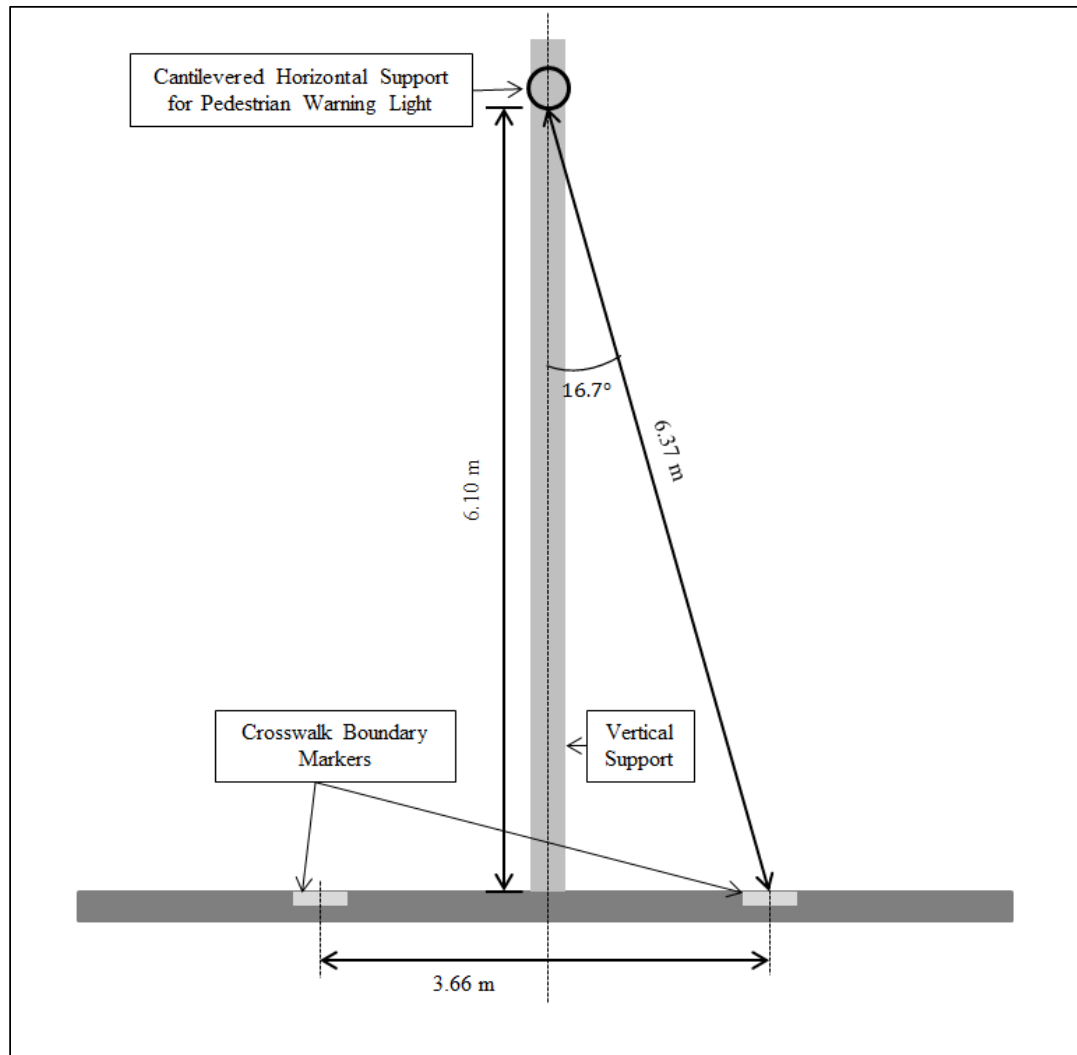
Cross Section view of the Mountain View Drive Crosswalk with approximate dimensions.
